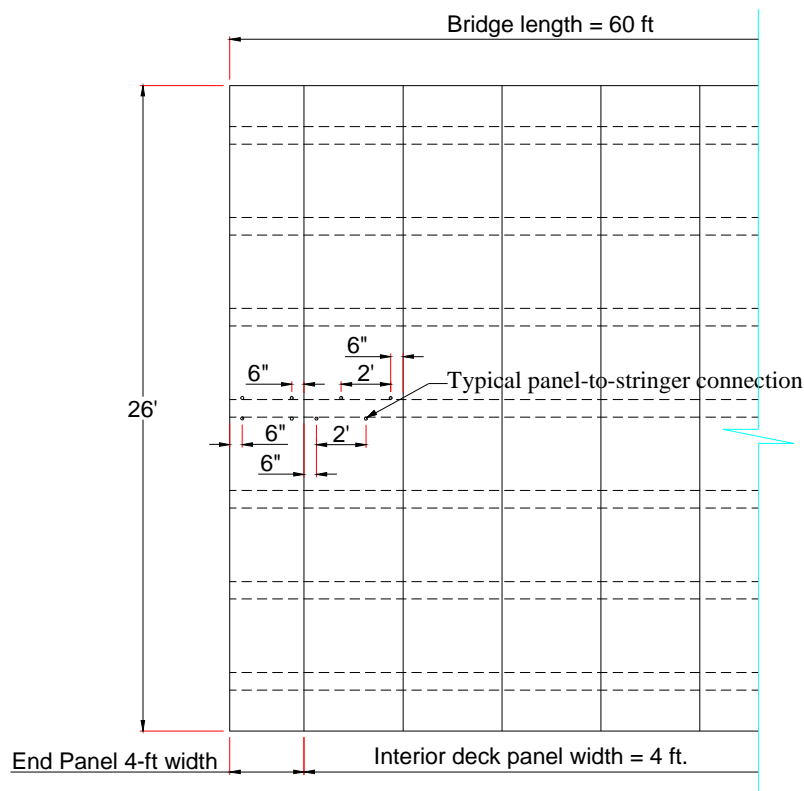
Deck Panel Layout for Unskewed 60-ft Long Bridge
